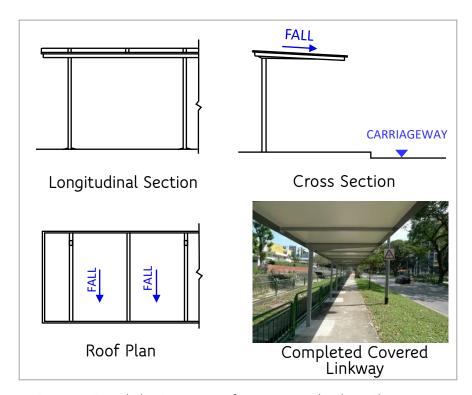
Typical Plan Presentation for Low Covered Linkway Plan
